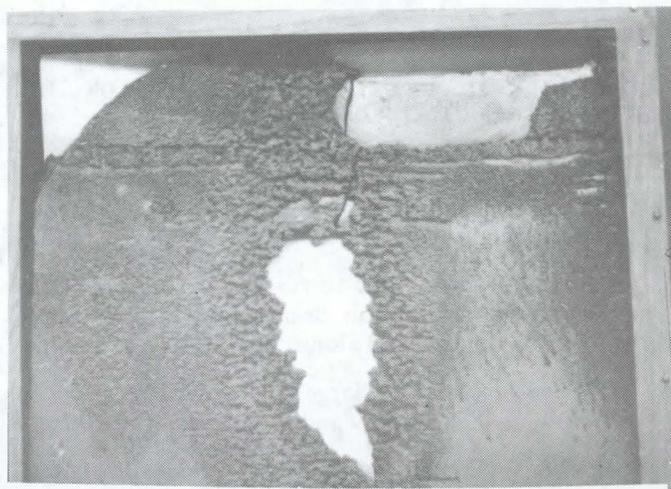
CAVITATION DAMAGE TO STEEL PIPE LINER. Cavitation has eaten through steel to expose concrete behind liner.
